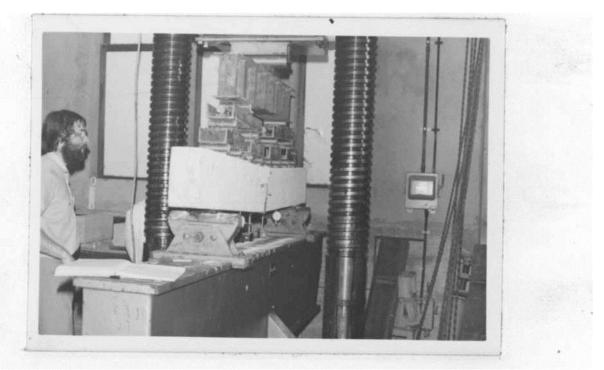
Combined shear and flexure failure of beam G2/3. Note concrete spalling
